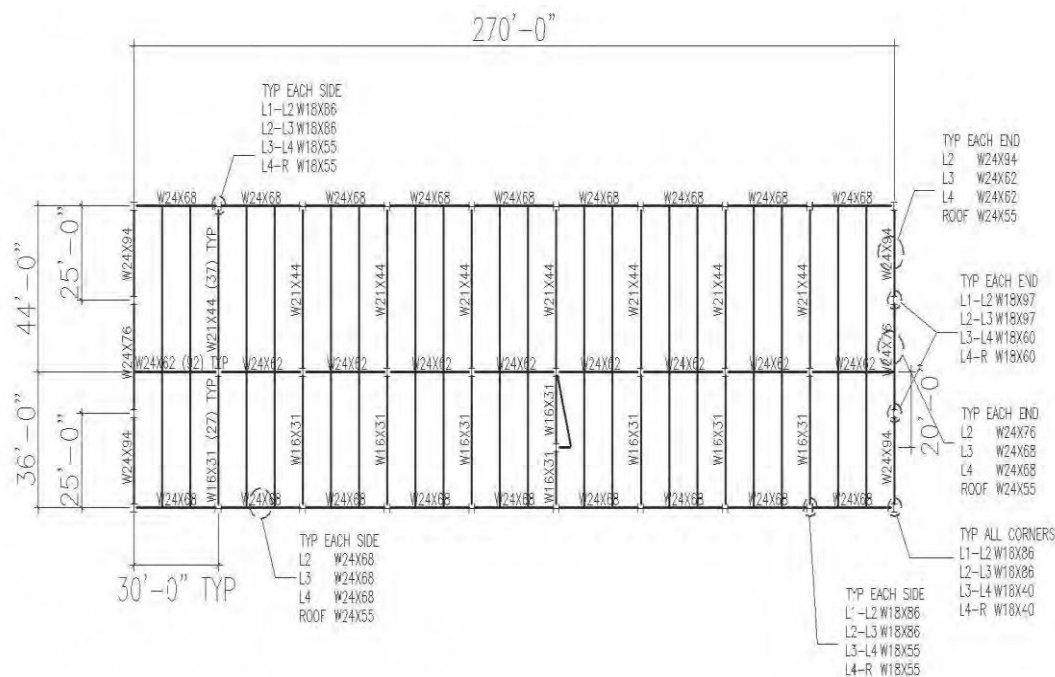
Plan view of the structure and member sizes [UFC 4-23-03].
